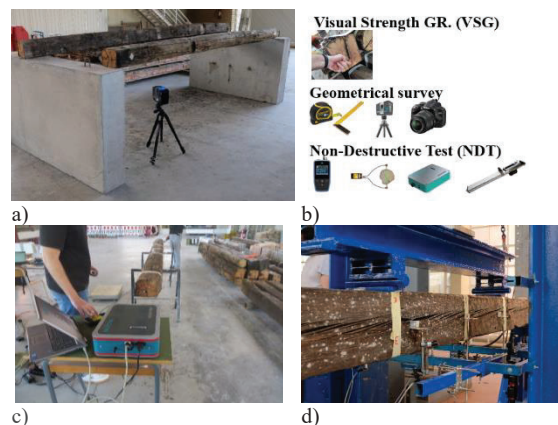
a) Geometrical survey; b) Used instruments, c) Non-Destructive Test; d) Destructive Test in bending.
